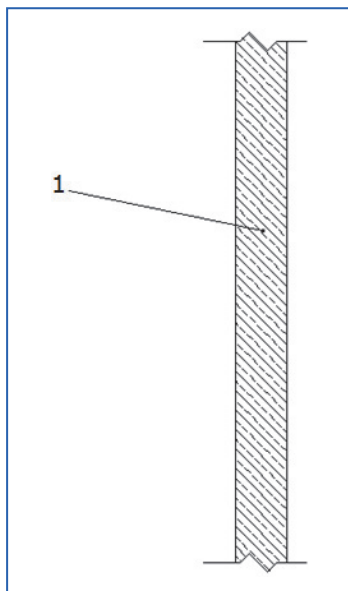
Wall. 1) 120-160 mm precast concrete panel.
